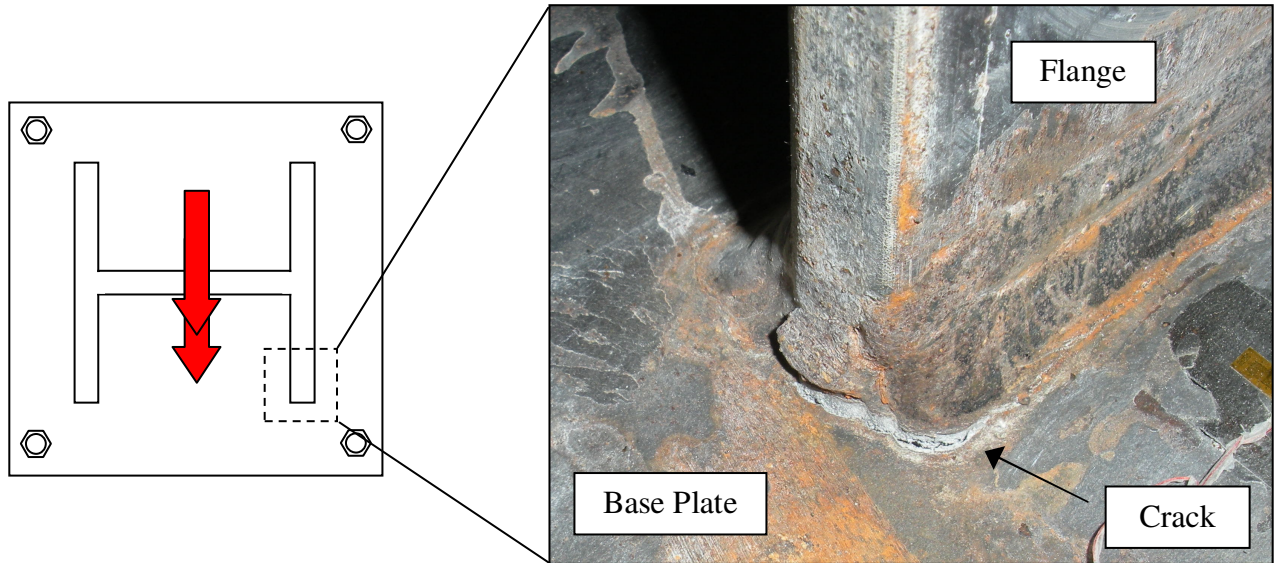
Fracture initiation of the column to base plate weld (shown here for Test #1)
